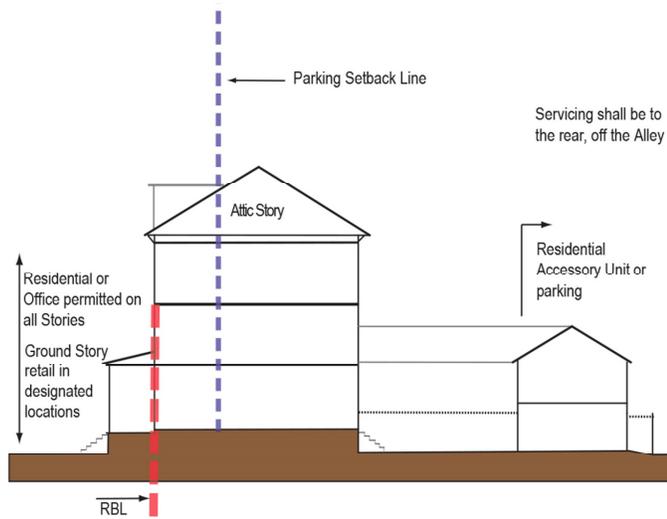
Townhouse/Small Apartment Use Standards
